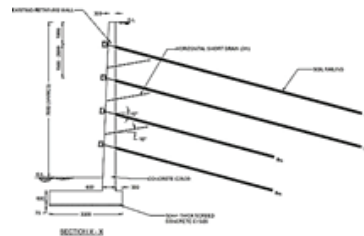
Stability of Slope (S) with the installation of soil nailing
